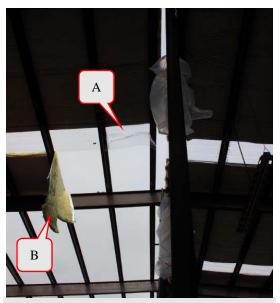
Skylight that collapsed under the roofer (A); insulation that tore (B).
